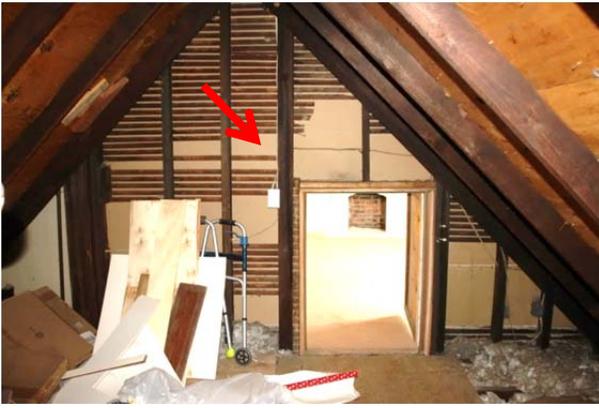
Attic above one-story north portion of the house, looking south into bedroom 2. Note the back of gypsum board on the wall over the remaining horizontal wood lath.
